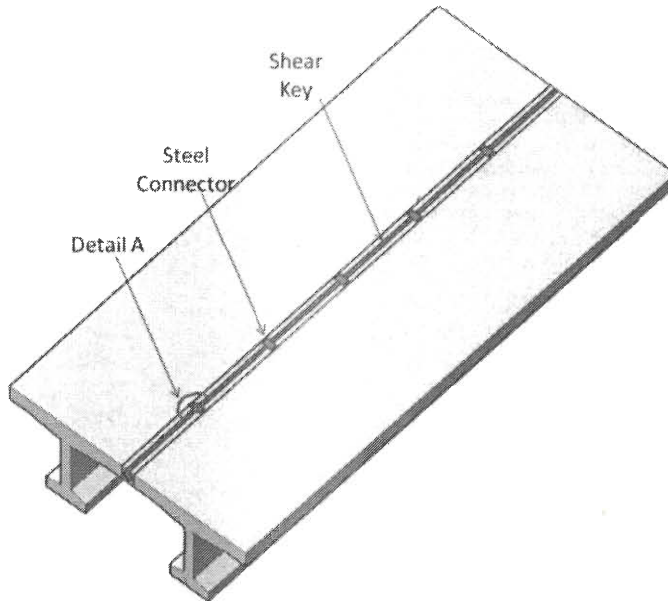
DBT Girders Connected by Longitudinal Joints with Welded Steel Connectors (Source: Stanton and Mattock 1986)
